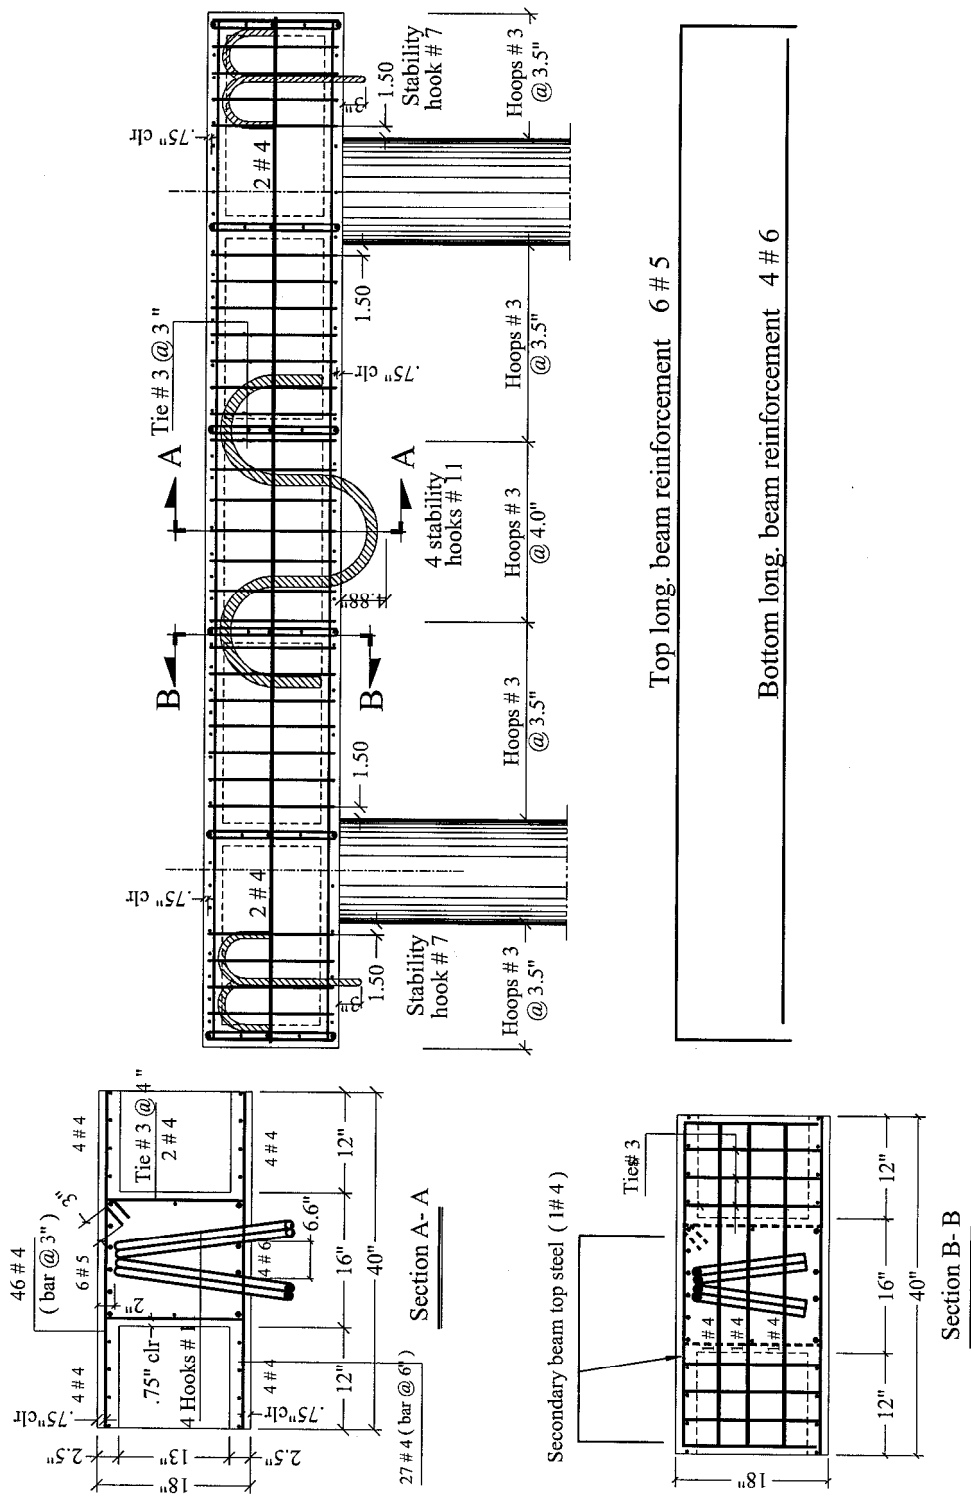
Details of Beam Reinforcement of both Specimens B2CT and B2CM, (English Units)
